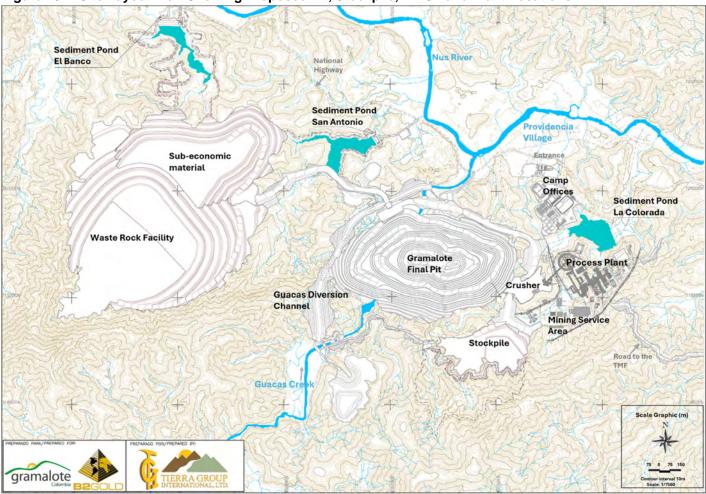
Site Layout Plan Showing Proposed Pit, Stockpile, WRSF and Plant Locations
